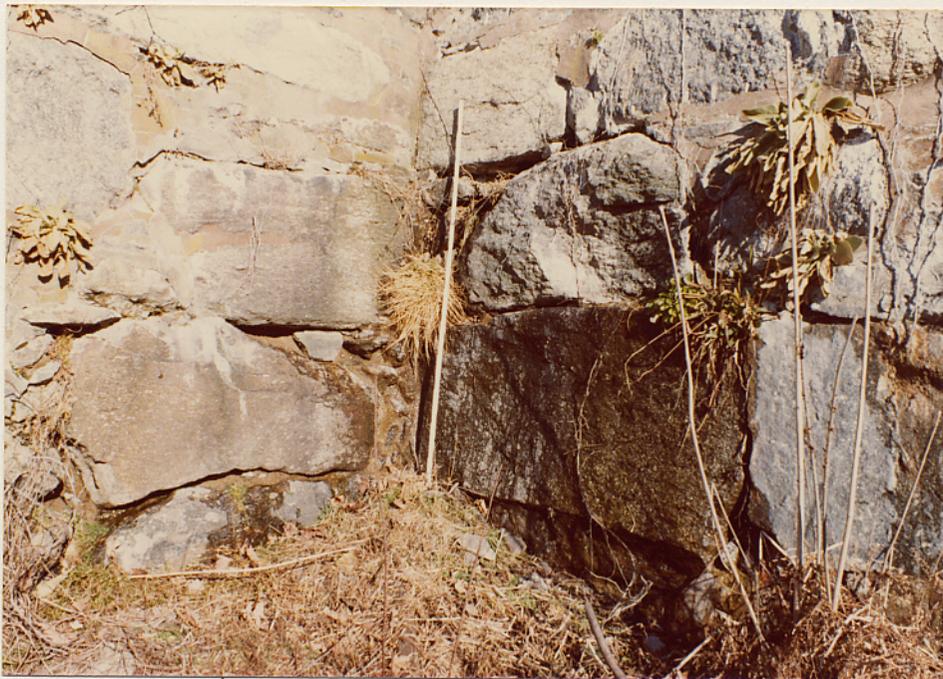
Seepage in corner of downstream face of masonry section. (Jan. 1980)
